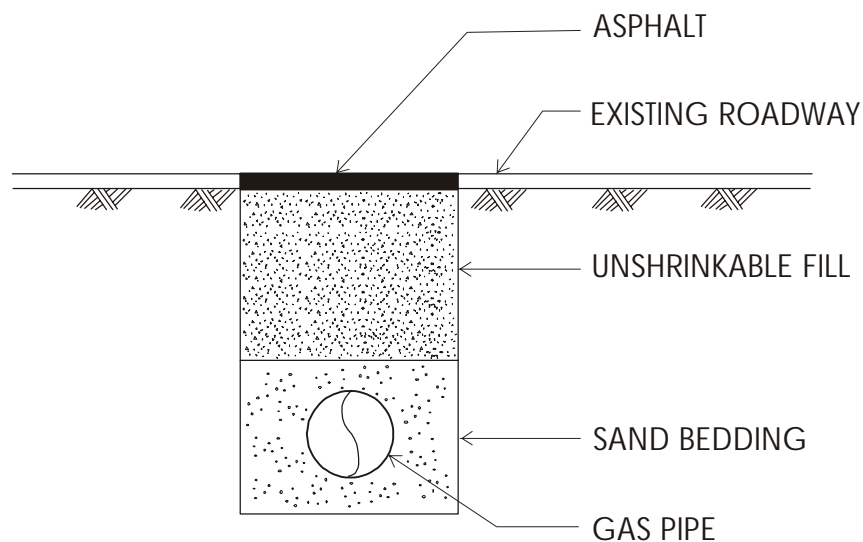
Cross-Sectional Diagram of Biogas Transmission Piping Installation
